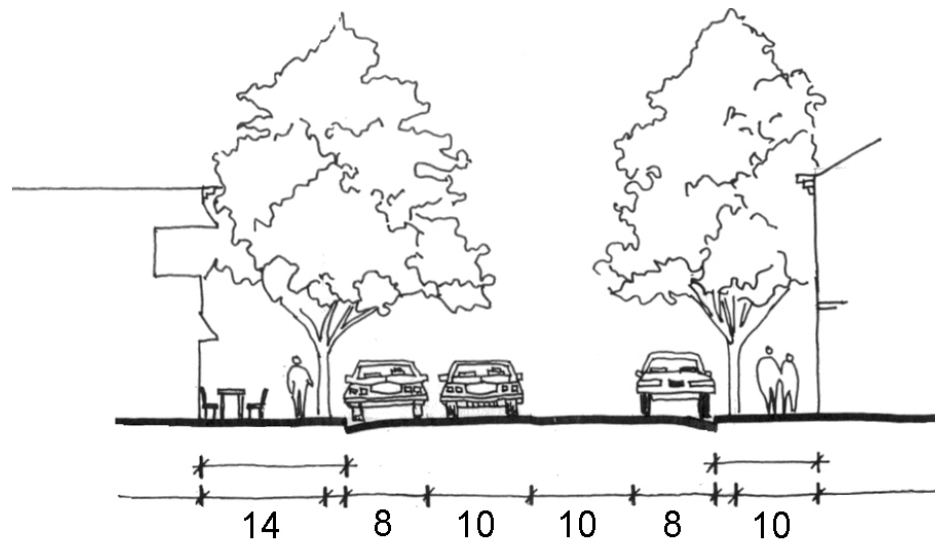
5 New development on Moreland Avenue will include a ten feet wide landscaped area between the sidewalks and the street, as well as ten feet wide sidewalks and outdoor dining or front yard areas.
